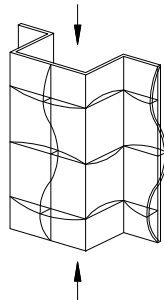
Local buckling of component walls of a cold-formed thin-walled section
